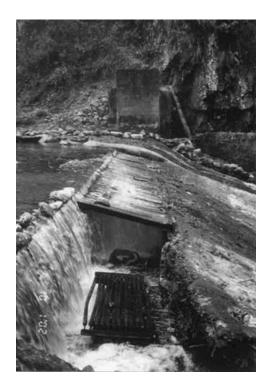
A typical bottom intake of a micro hydropower plant, Nepal.
